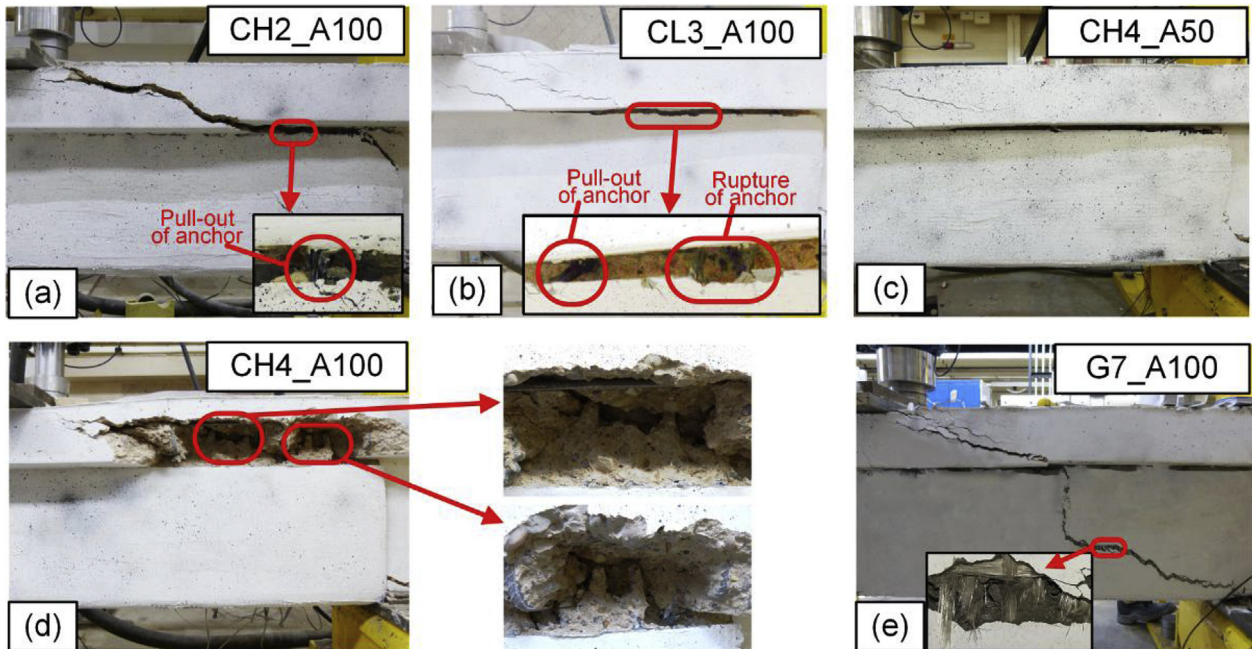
Failure modes of TRM-retrofitted specimens with anchors: (a)–(c) Specimens CH2_A100, CL3_A100 and CH4_A50 – rupture of some anchors and pull-out of the rest; (d) failure of specimen CH4_A100 due to concrete splitting in the slab; (e) fracture of glass TRM jacket in specimen G7_A100.
